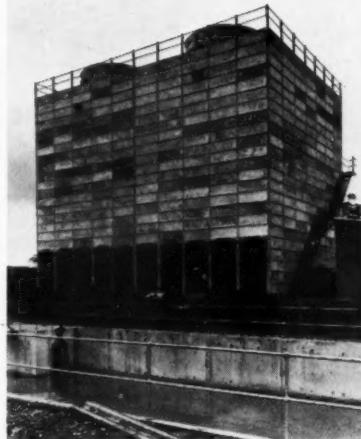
Induced-draught cooling tower utilising precast concrete units.
